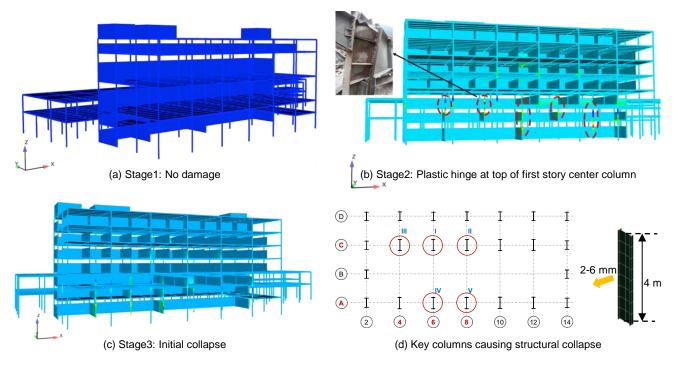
Axial forces of the beams and columns of the building. (a) Stage 1. (b) Stage 2. (c) Stage 3. (d) Critical elements
